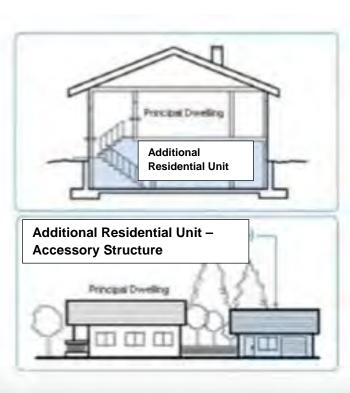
Additional Residential Unit - Basement and Accessory Structure
